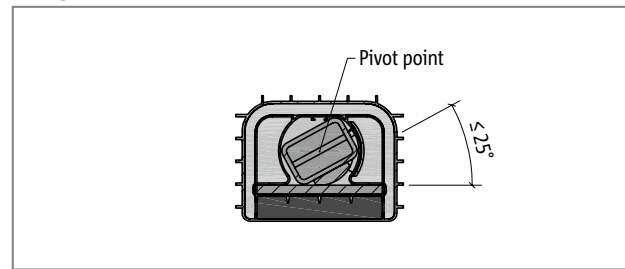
Schöck Tronsole® type Q: Installation variant inclined installation of the load-bearing element
